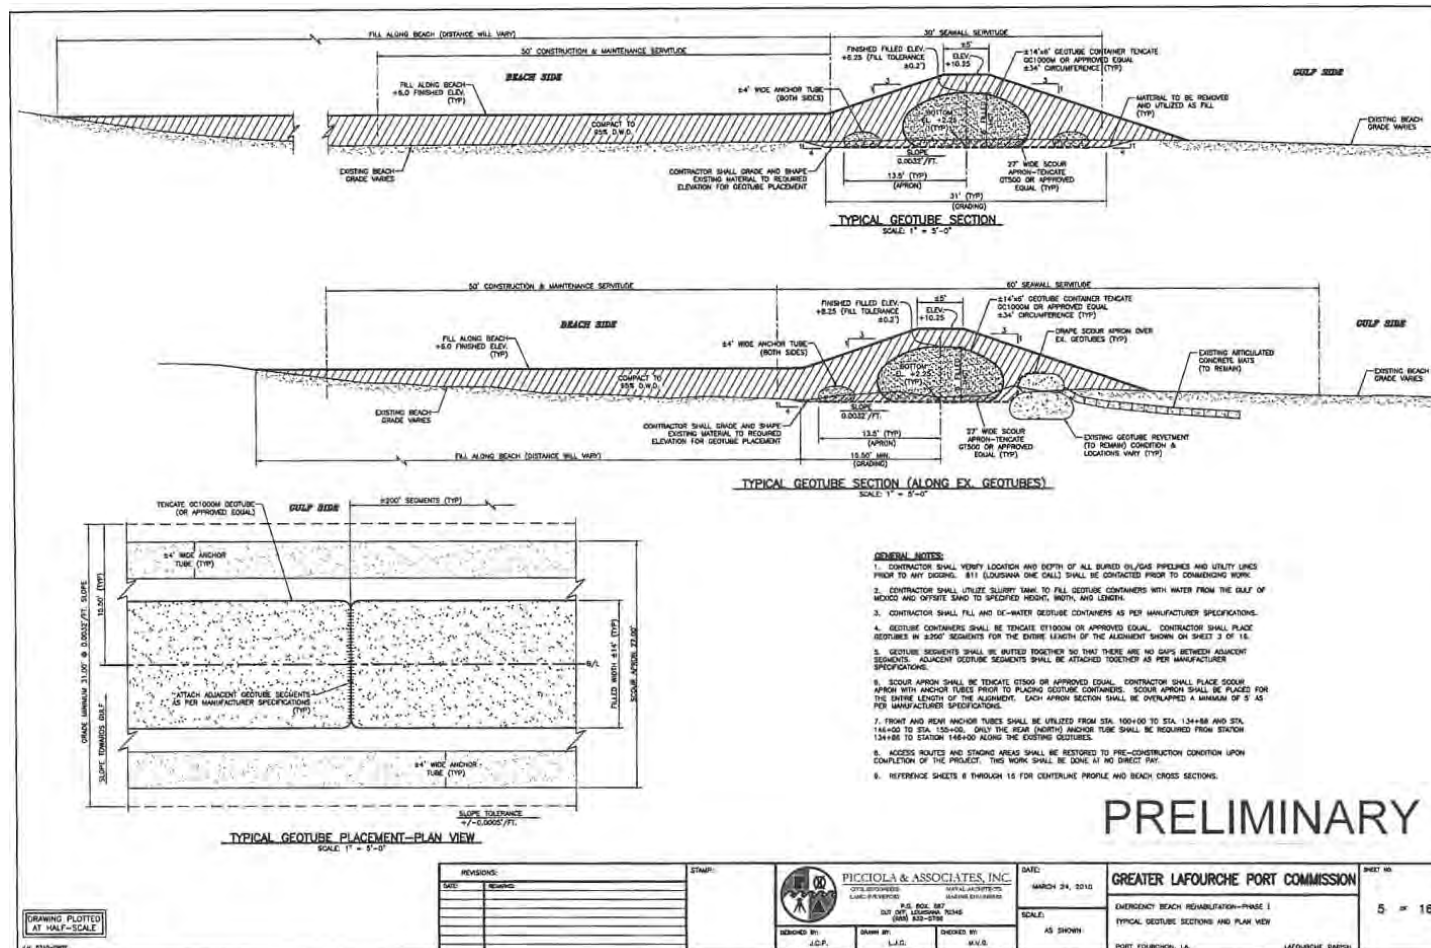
Fourchon Beach Geotube System Detail Plan View (Picciola & Associates, 2010)
